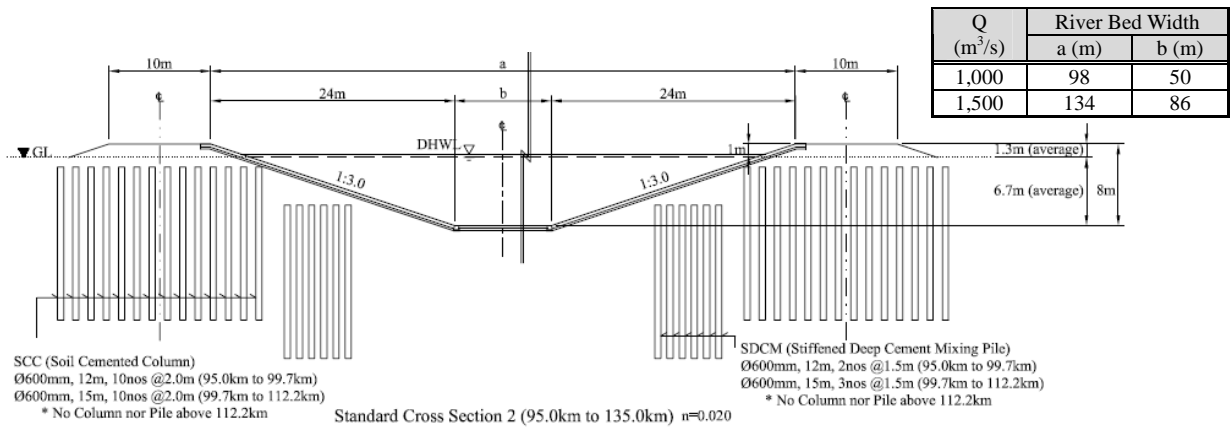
Alternative Cross Section of East Diversion Channel with Slope and Riverbed Protection (95km to 135km)
